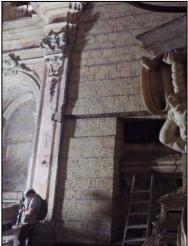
Construction details of the walls and vaults of the church of San Pietro in Vinculis
